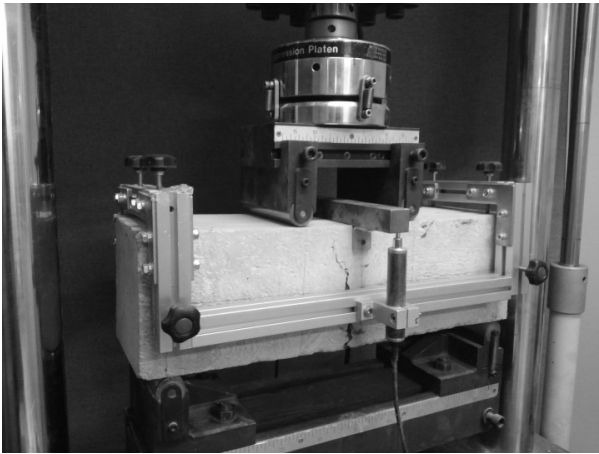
Flexural Test of Fiber Reinforced Concrete Beam
